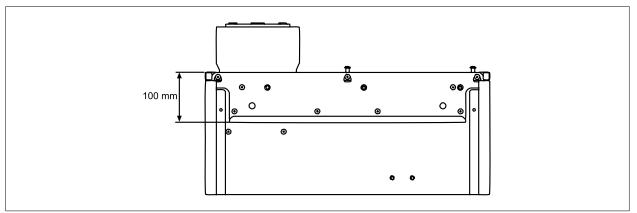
Mounting brace on the rear of the gas condensing boiler
